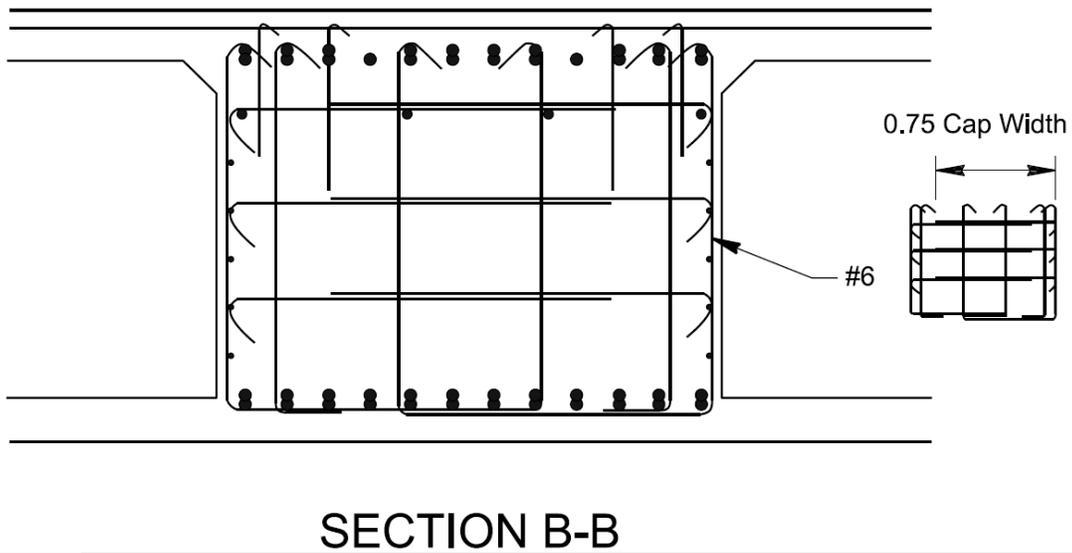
Joint Reinforcement Outside the Column Region
